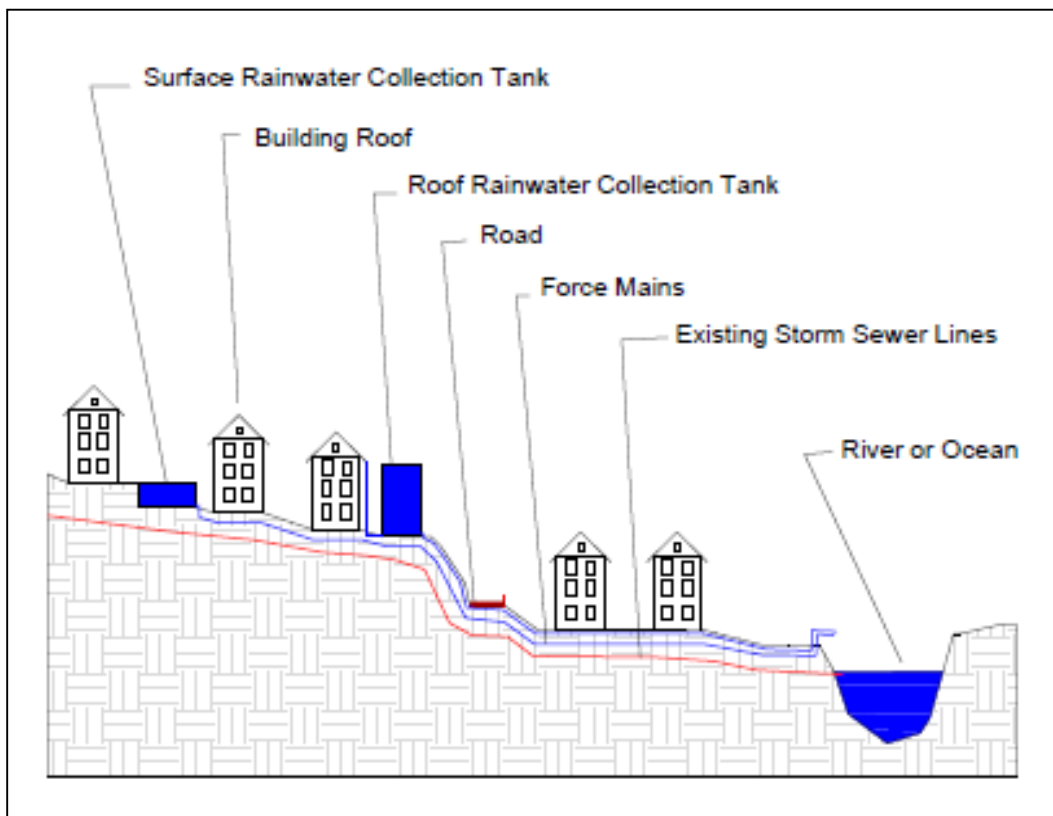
Illustrative Sketch of Bypass Force Mains for Elevated Areas to Improve Stormwater Drainage
